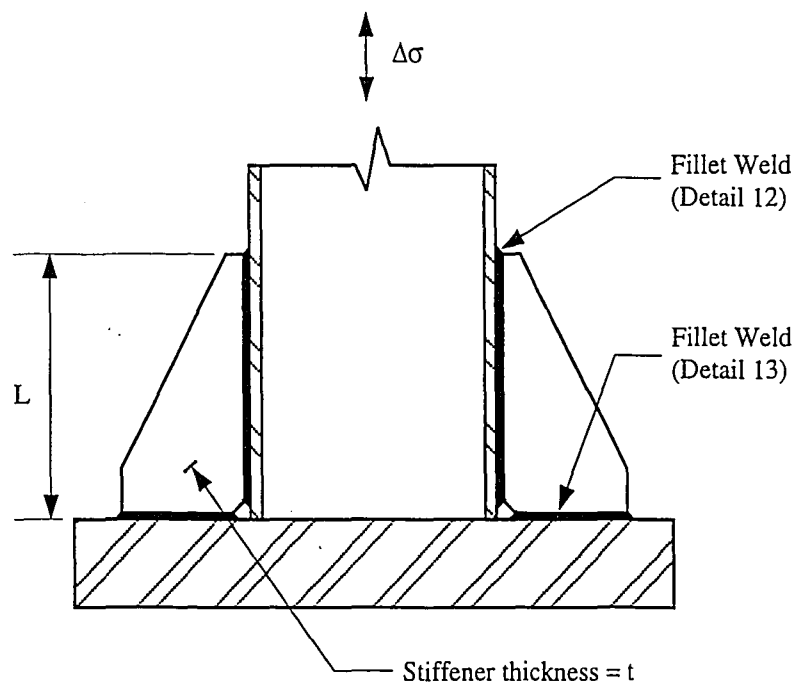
Non-Load Bearing Longitudinal Attachment.
